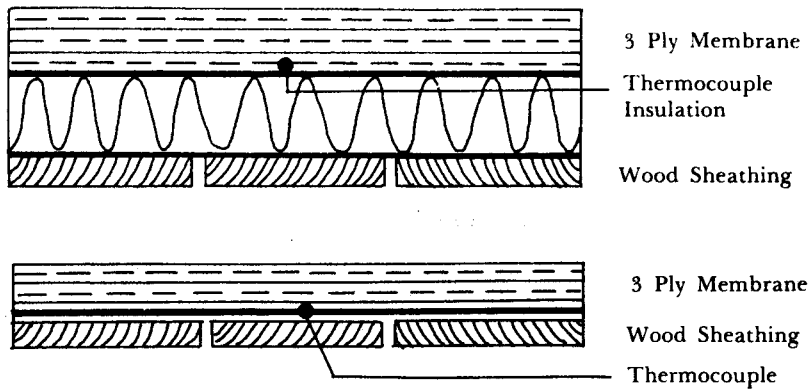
ROOF CONSTRUCTION DETAIL
